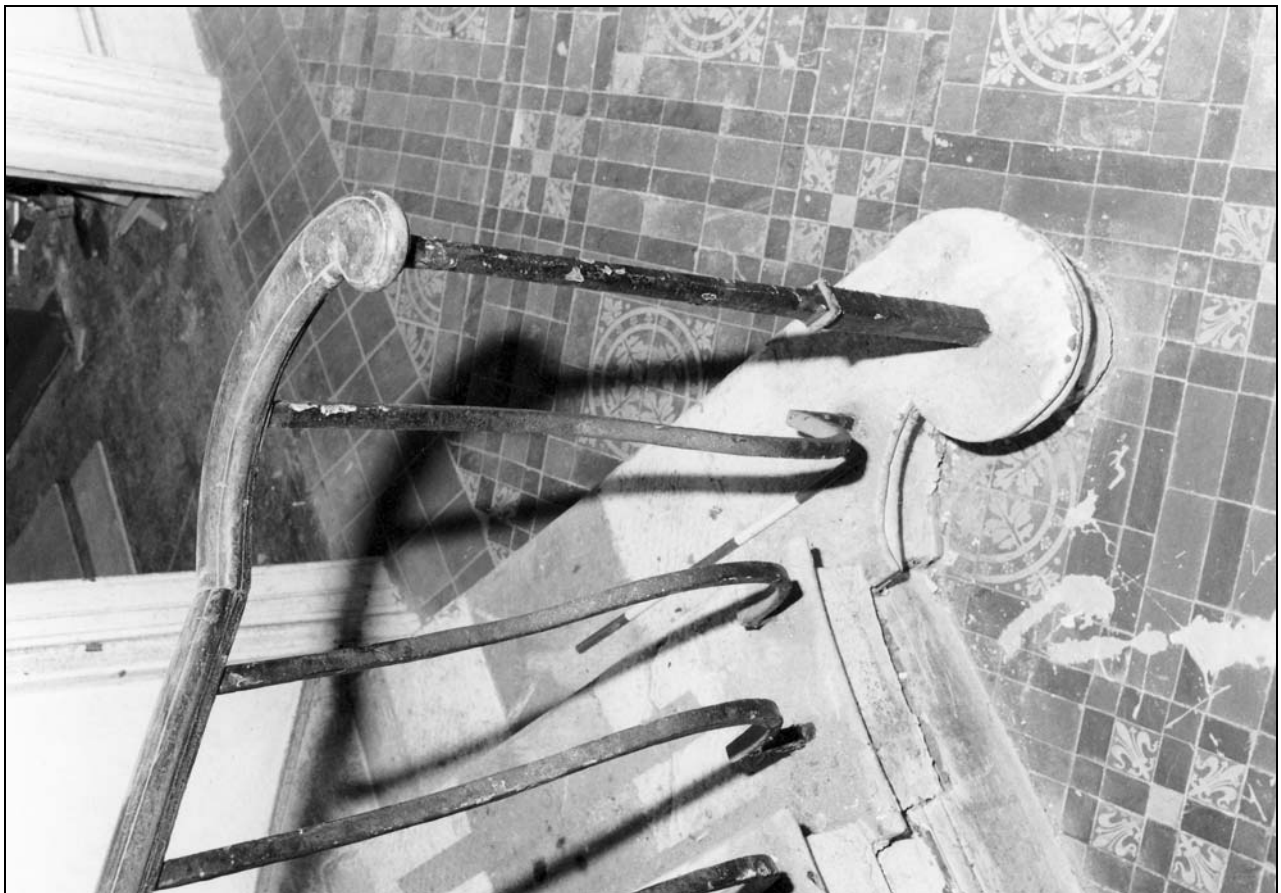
South wing: foot of staircase in entrance hall G11 (film 2, frame 9)
